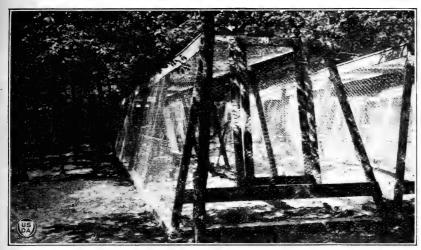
Pens with slanting sides and wire top built on concrete base. Wall may be sunk into the ground as in other pens if desired, instead of using concrete base.
